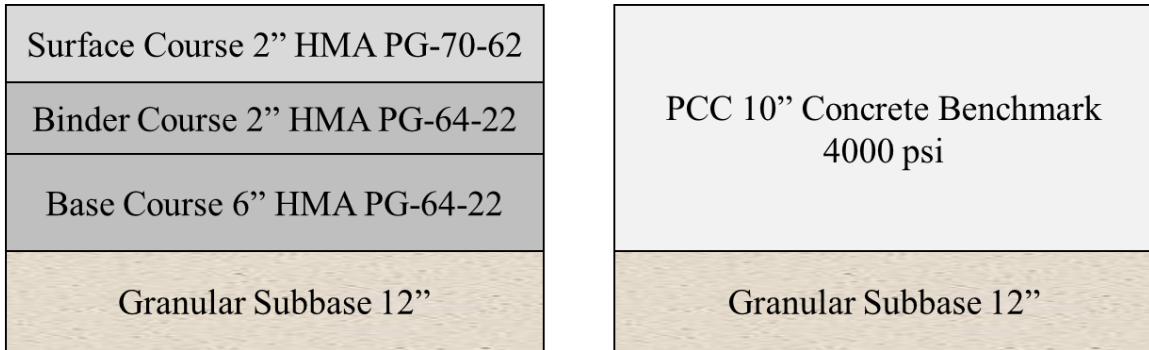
Demonstration roadway pavement geometry: Flexible (left) and Rigid (right)
